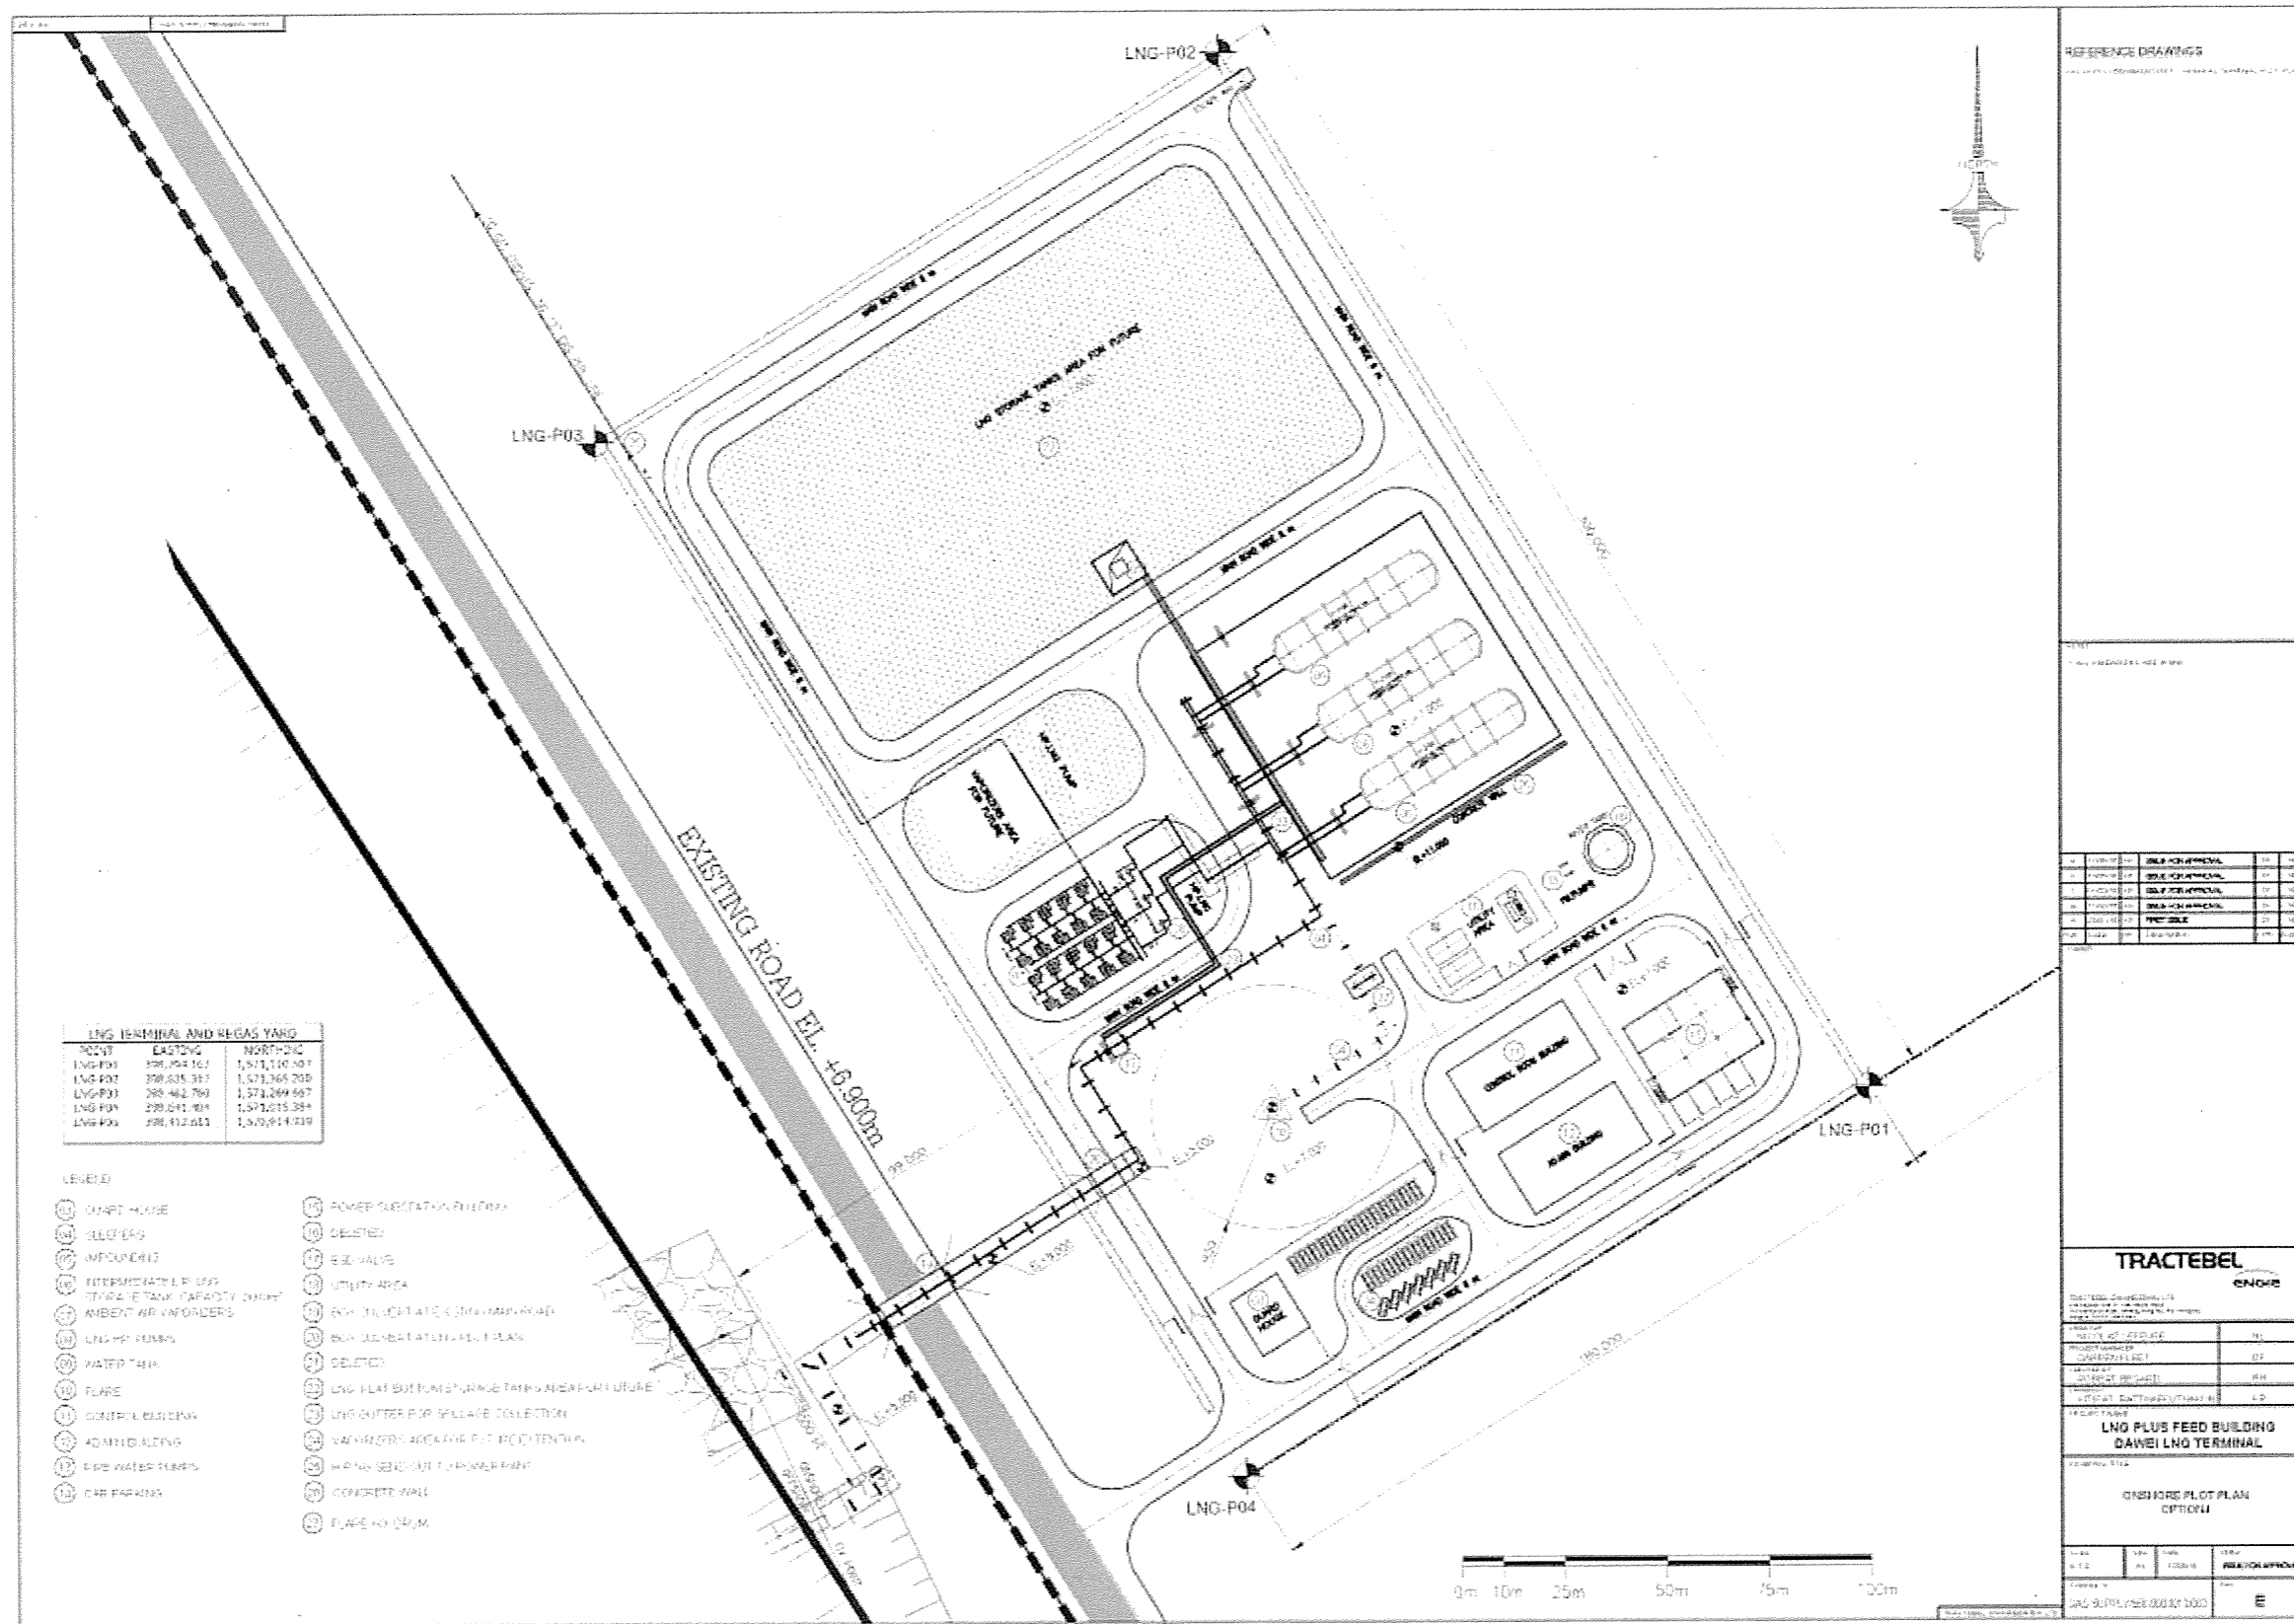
LAYOUT OF ONSHORE FACILITIES
